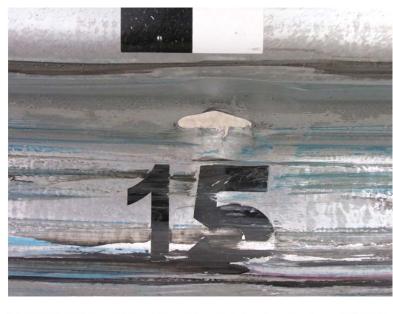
Post-To-Rail Bolt Hole Damage, Test No. MGSMRH-2
